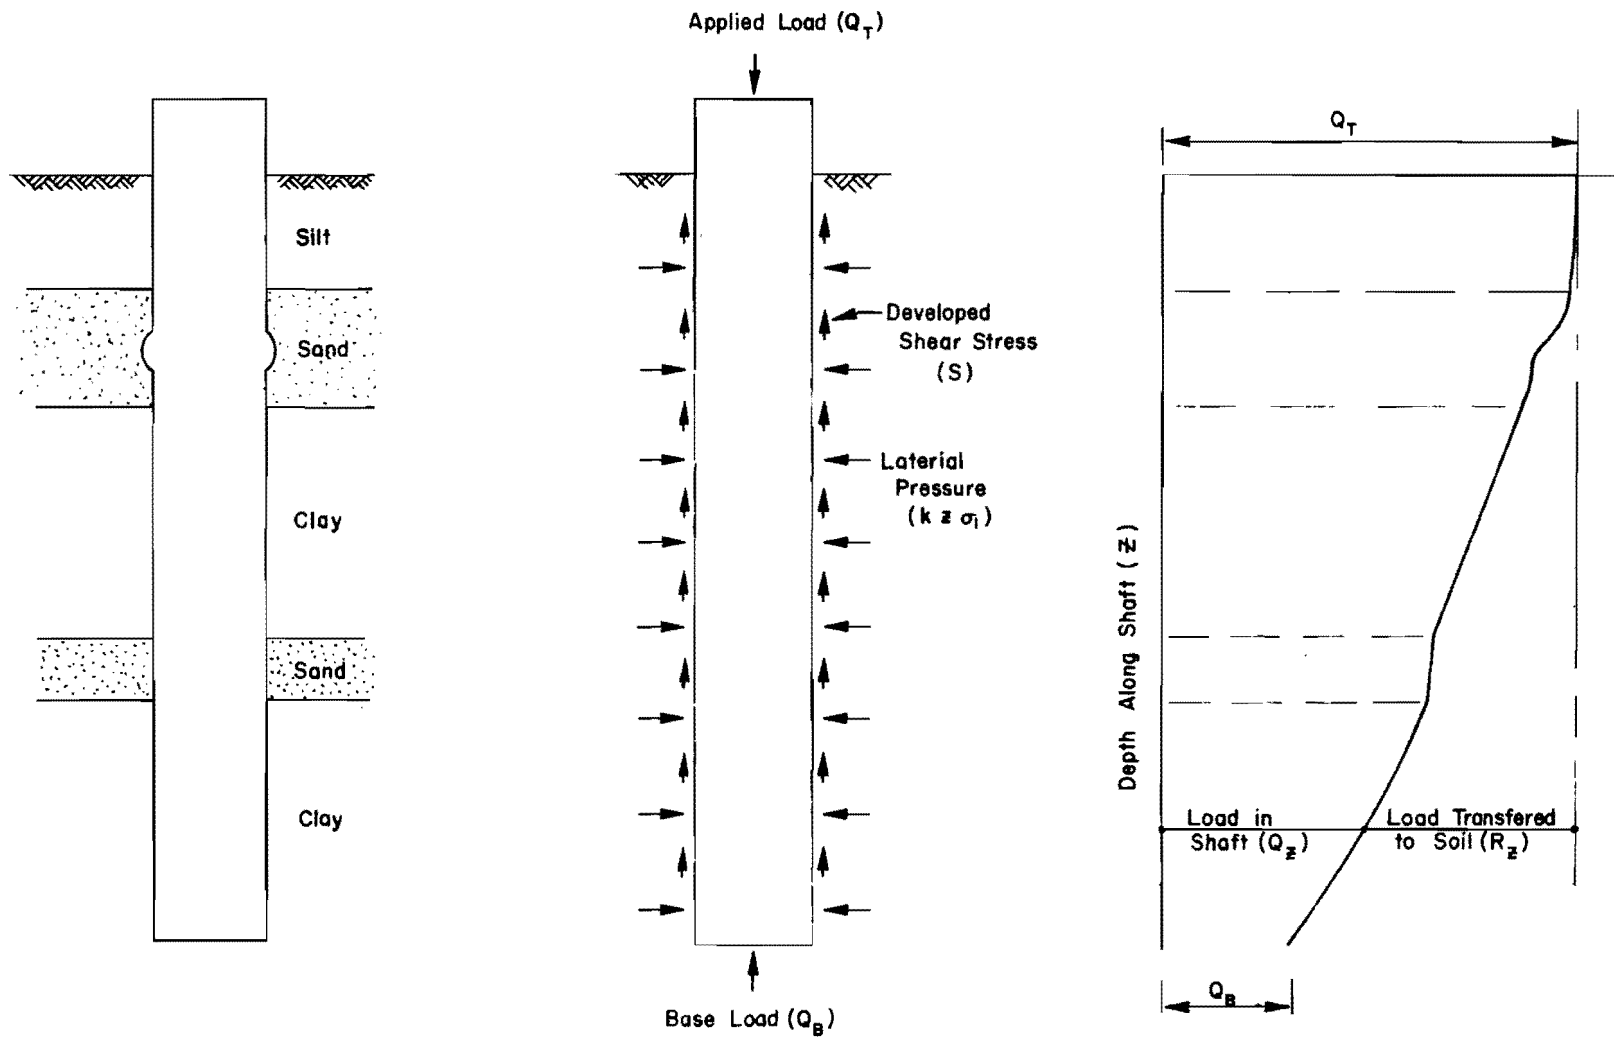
Typical Drilled Shaft in a Layered-Soil System
